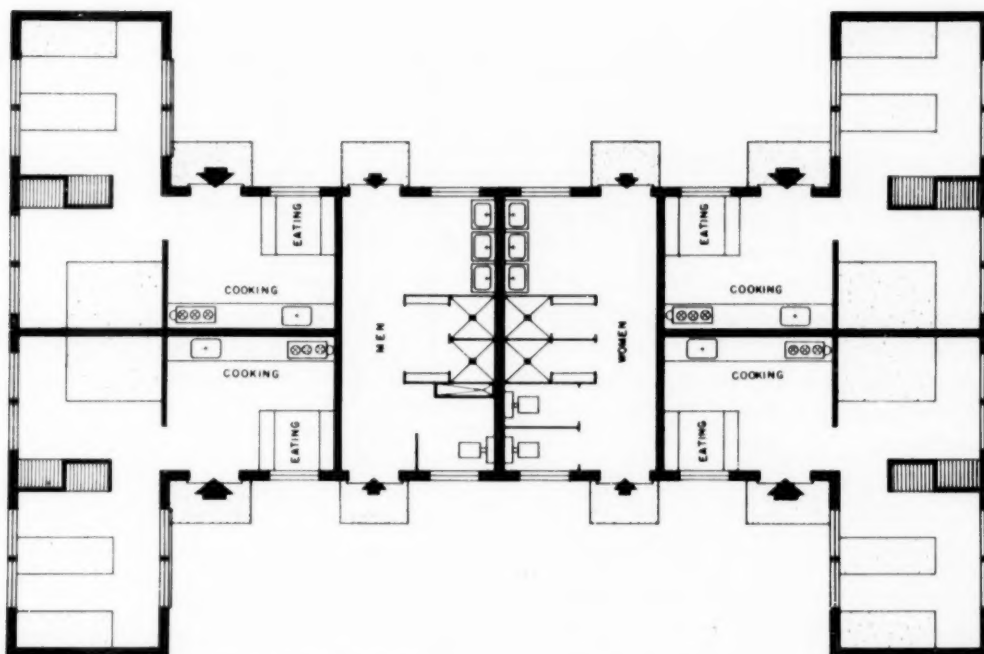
Another variation of the H-shaped arrangement with bath and toilet facilities included to be accessible for workers housed in other buildings. Plan #2407
